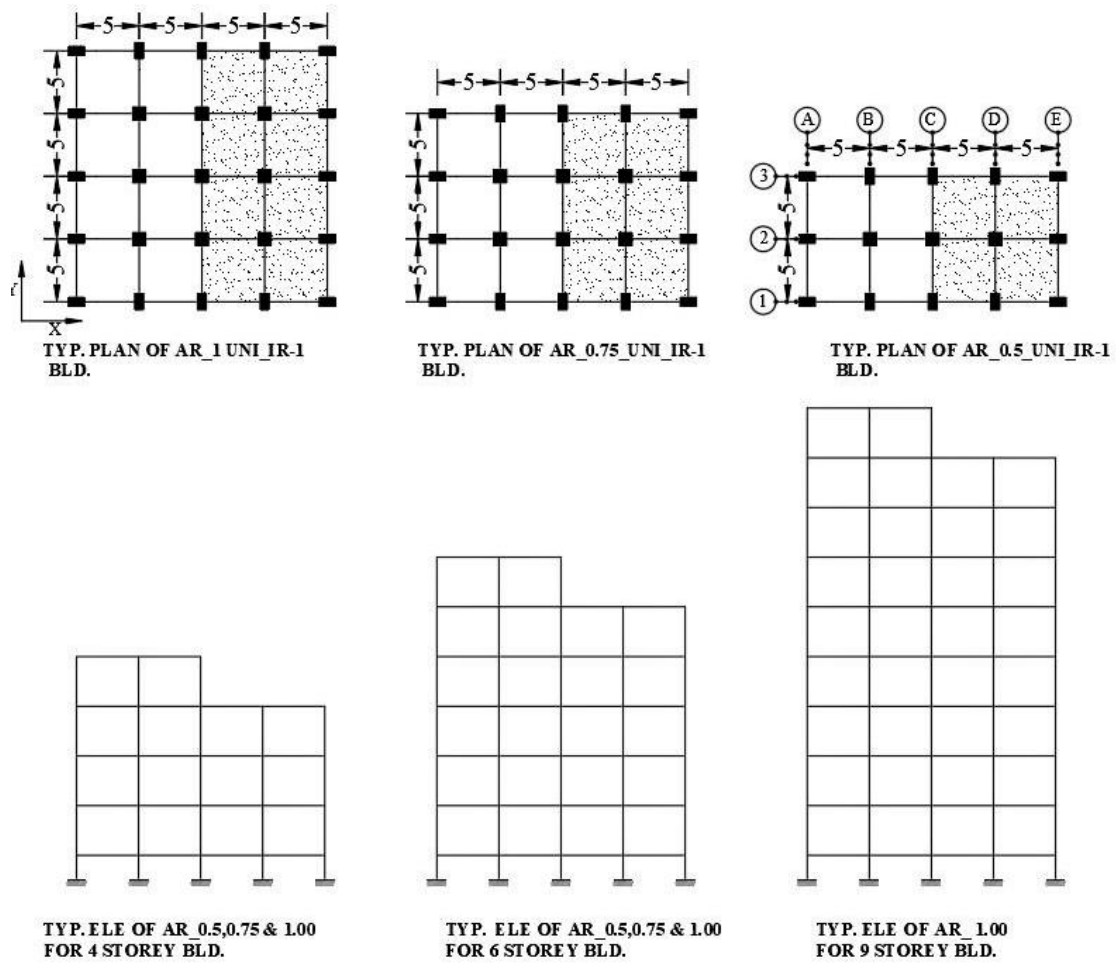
plans and elevations of 4, 6, and 9 storey buildings with unidirectional setback
